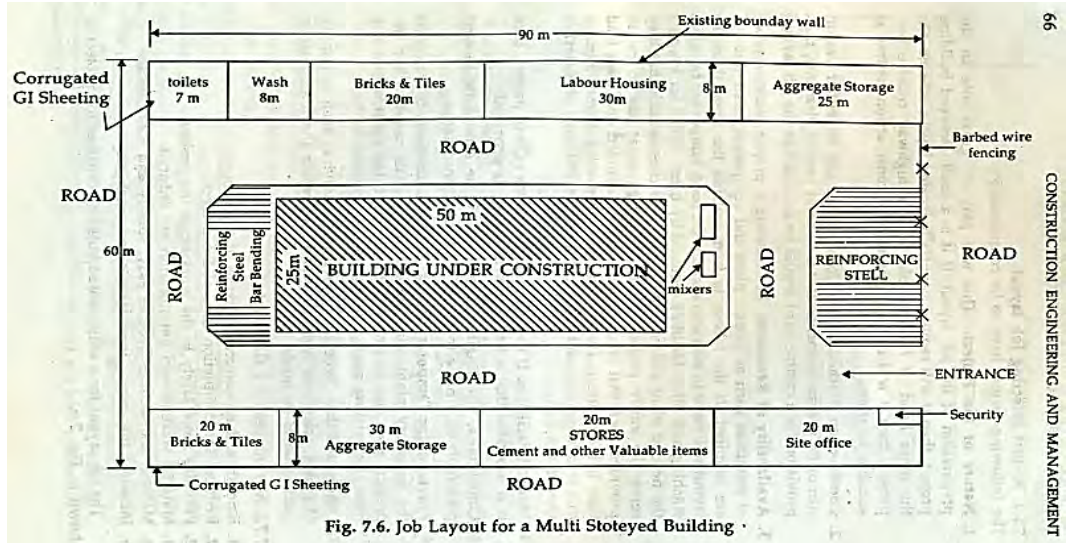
Job Layout for a Multi Stoteyed Building
